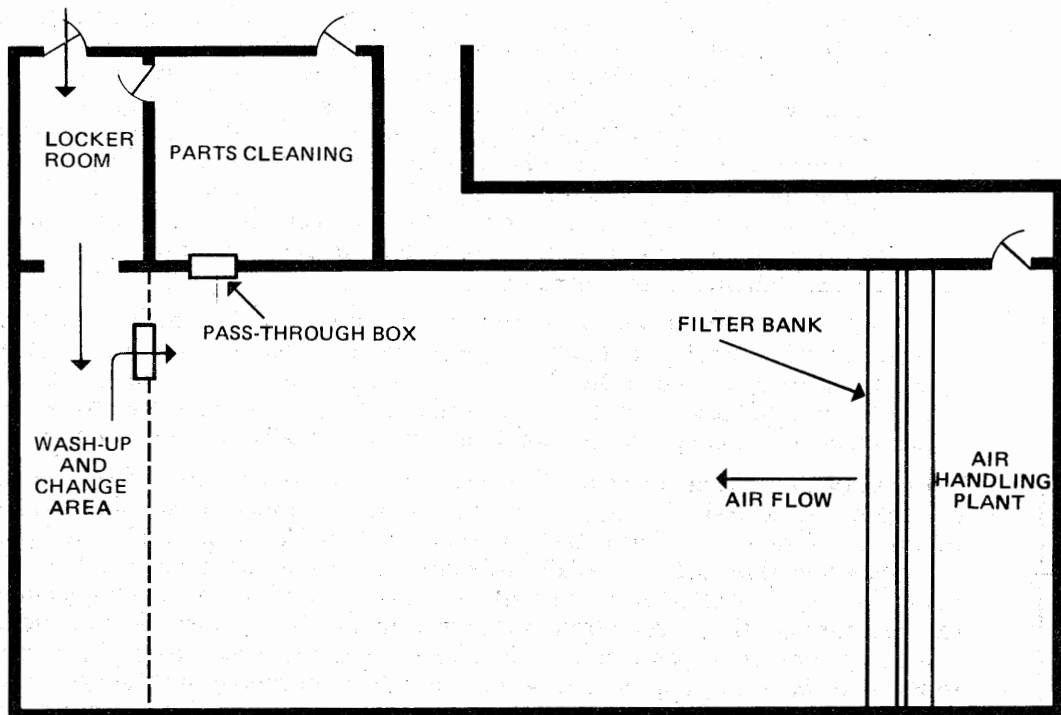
LAYOUT OF A TYPICAL CONVENTIONAL CLEAN ROOM
